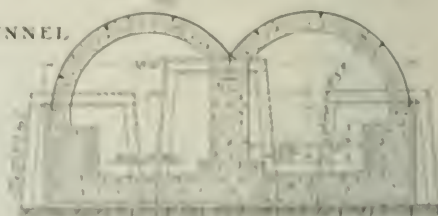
TUNNELS UNDER NYC &amp; HRR
